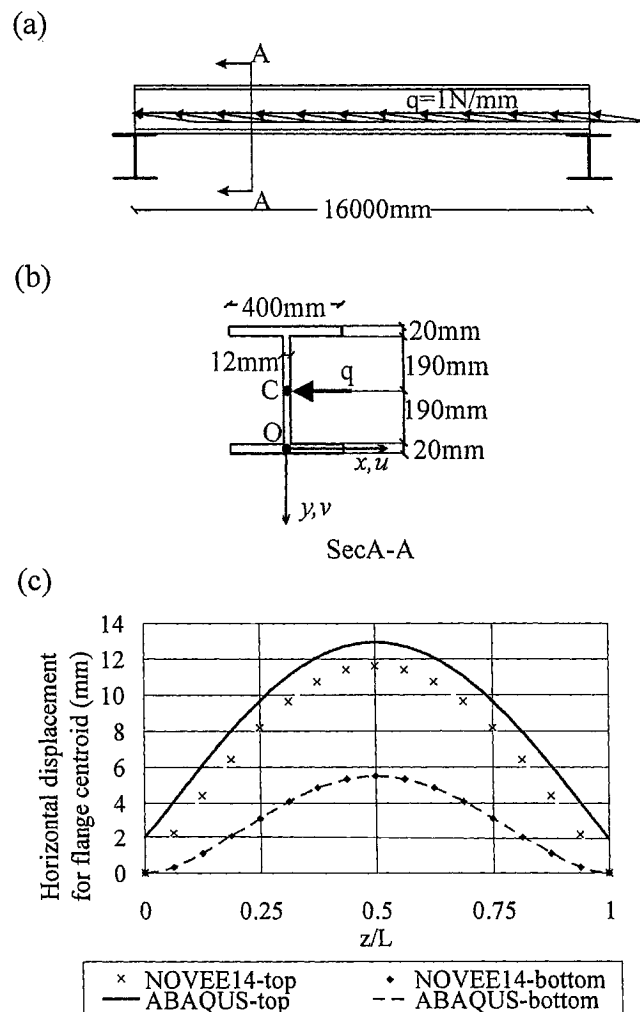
Example III.4-Eccentrically supported beam (a) Geometry (b) Cross-section dimensions (c) Horizontal displacements
